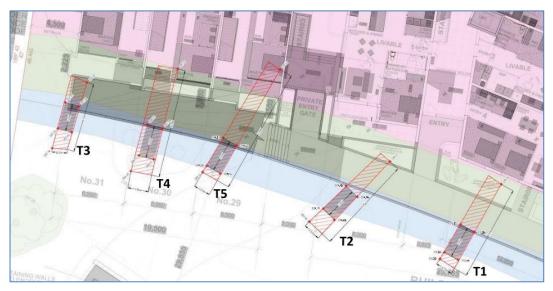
Survey plan of five trenches (taken from Heathcote Hall Driveway Testing Results, prepared by Casey and Lowe, September 2018)
